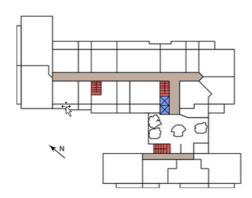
Case 3 Level 2 Floor Plan Source: Diagram by A di Lembo QUT.
